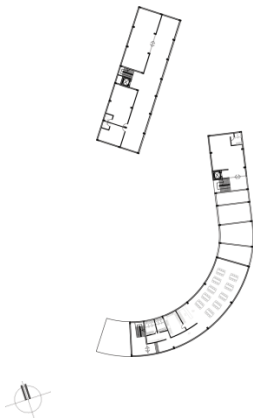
First Floor Plan of Administrative and residential block (Source: Author)
